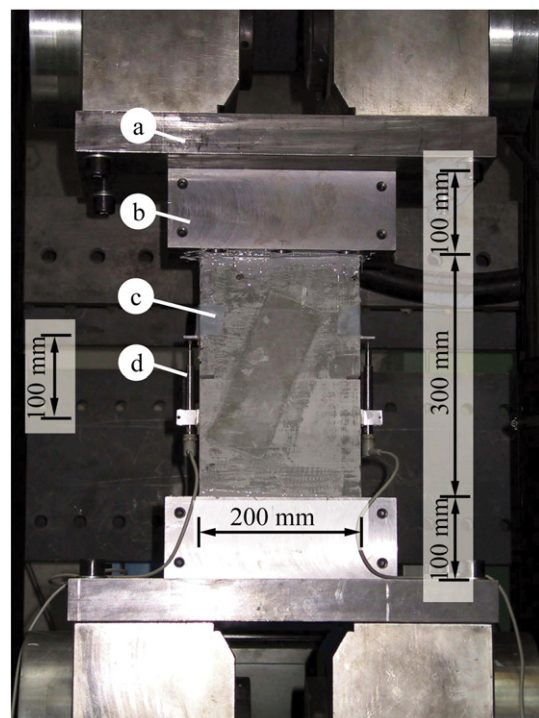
Configuration of the tensile test set-up. a) base plate, b) grooved grip, c) specimen, d) linear variable differential transformer.
